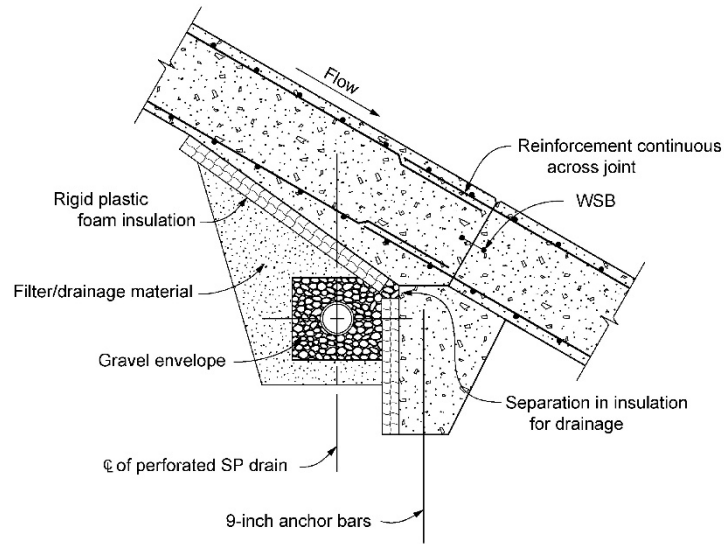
Detail of joint between consecutive slabs proposed by the FEMA (William Fiedler)
